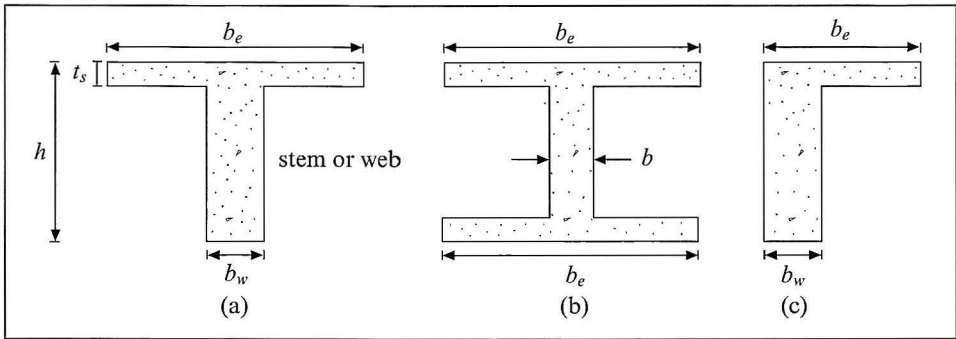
Flange section; (a) T-section, (b) I-section, (c) L-section.
